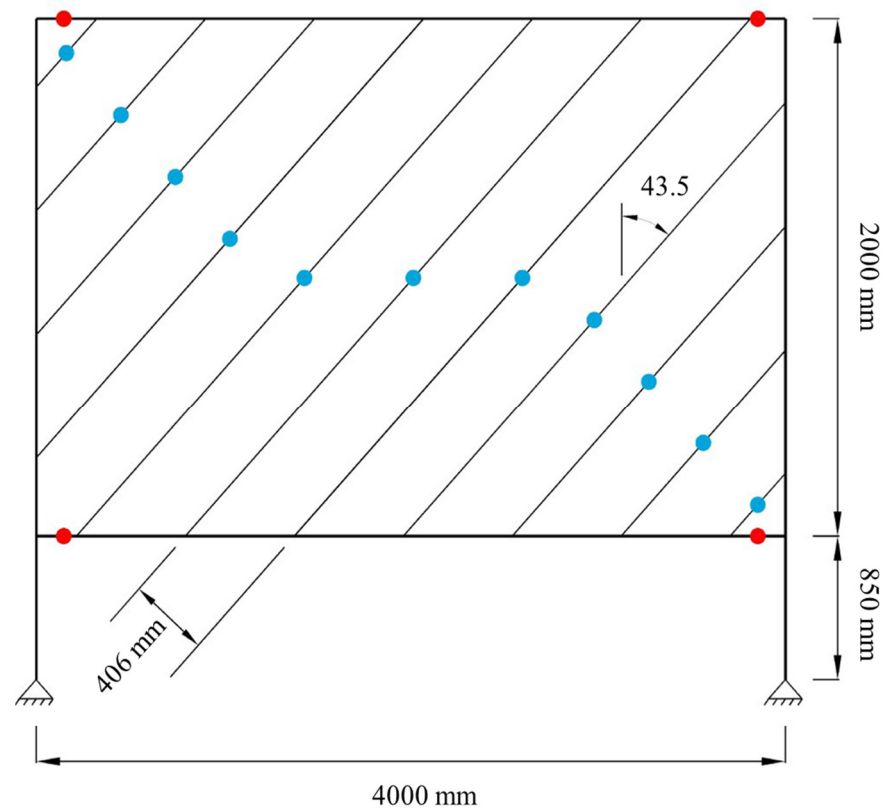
Tension strip layout for the modeling of the SPSW developed by Vian et al. [32].
